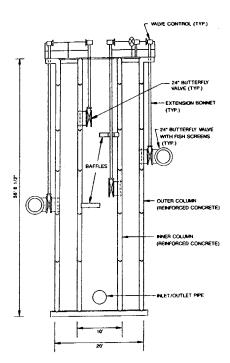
Inlet/outlet tower cross section showing intake points and inner column with aeration baffles.
